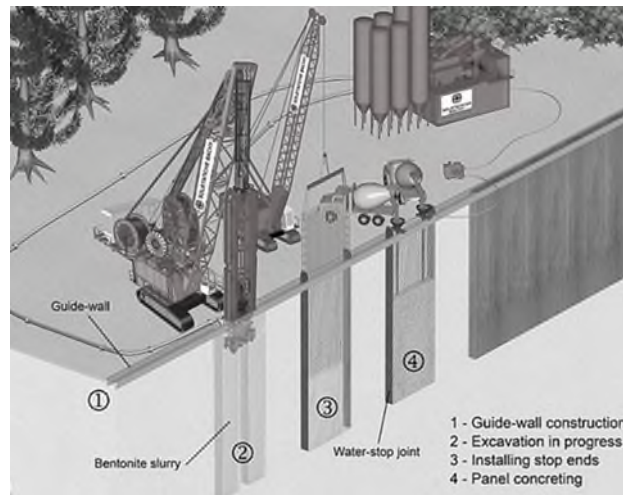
The scheme of stages of works at construction of a diaphragm wall.
